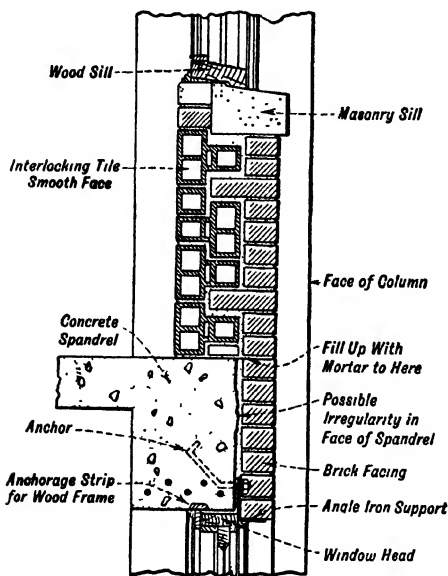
Spandrel Beam Faced with Brick, with Curtain Wall of Face Brick and Interlocking Tile. (See p. 746.)
